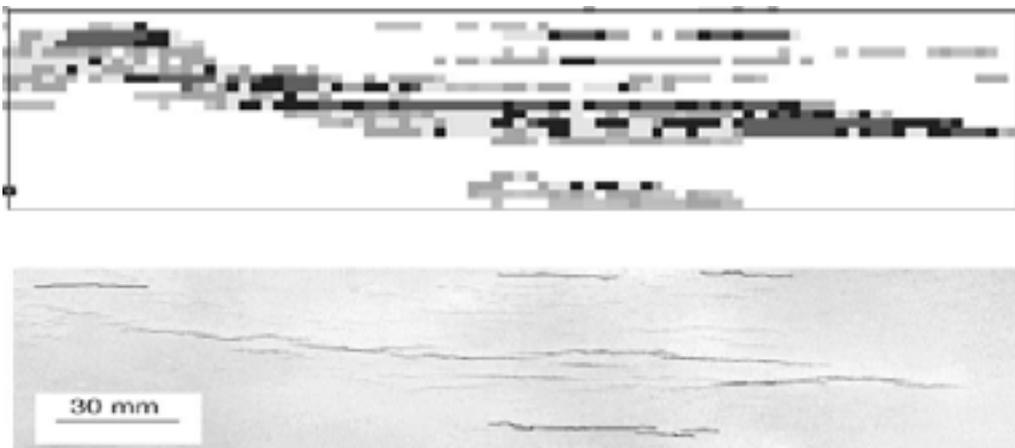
Stress-corrosion cracks (SCC) detected by angled-beam ultrasonic tool.
